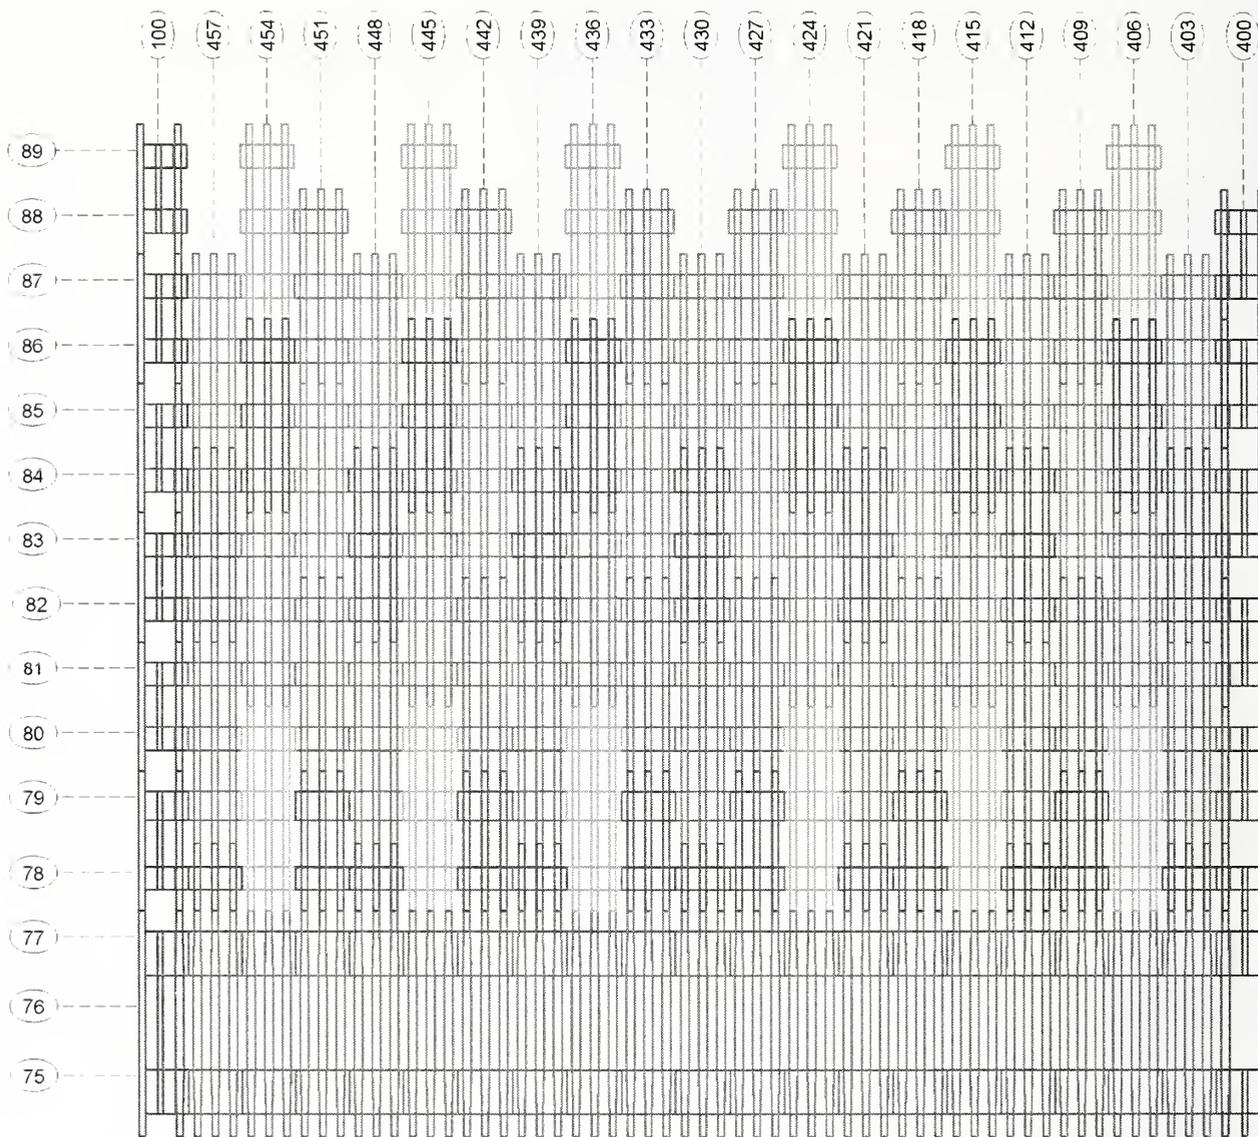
The arrangement of steel panel sections over the 12 floors above the mechanical equipment room on the 75th and 76th floor of the south face of WTC 2 is shown. Column and floor numbers are indicated.
